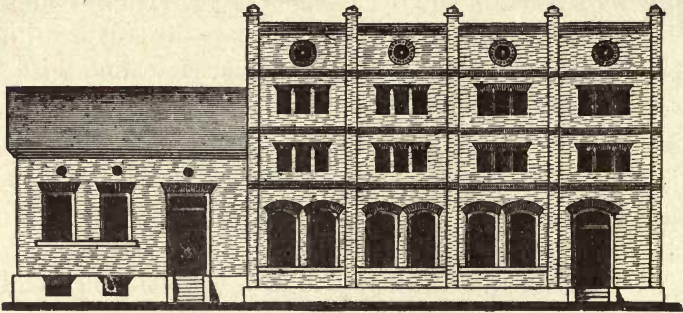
Elevation of oil factory buildings (Knäbel).
